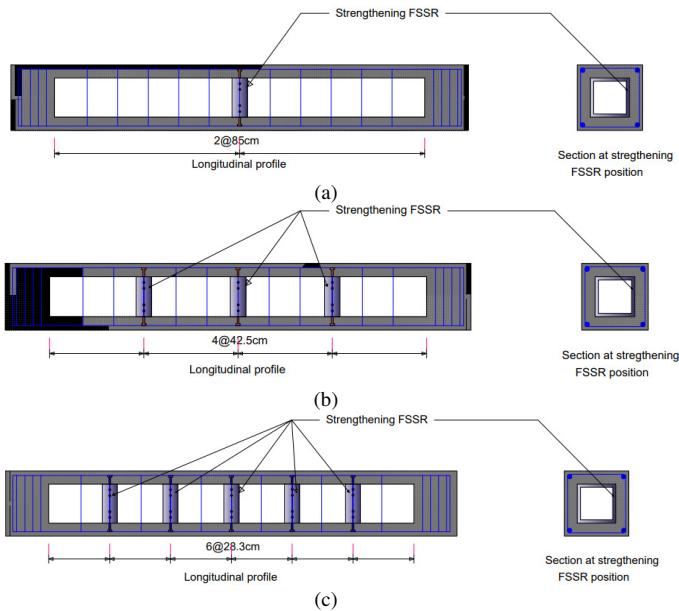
Details of strengthened test beams. (a) 2N1OF or 5N1CF with one strengthening FSSR., (b) 3N3OF or 6N3CF with three strengthening FSSR, and (c) 4N5OF or 7N5CF with five strengthening FSSR.
